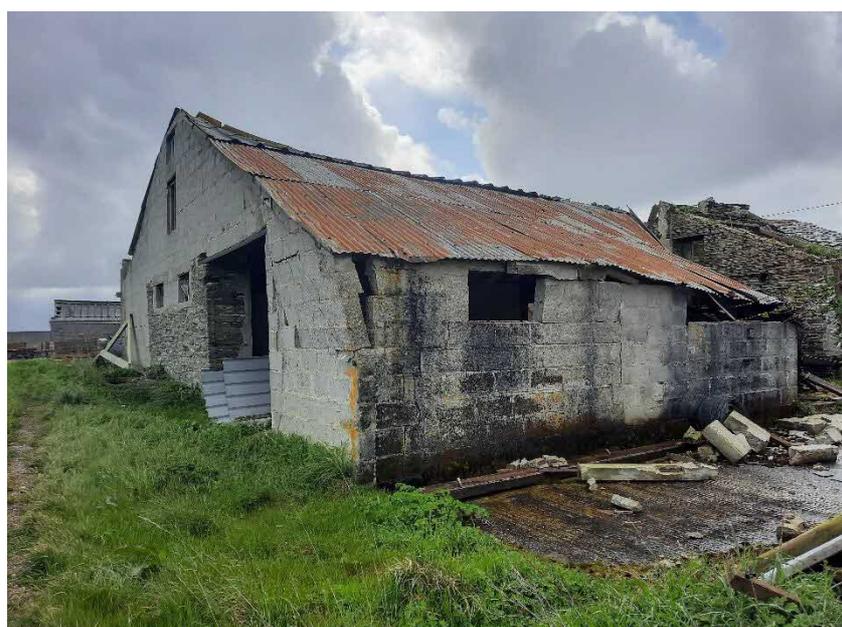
View of part of the block-built section on the northwest elevations of Barn 2.
